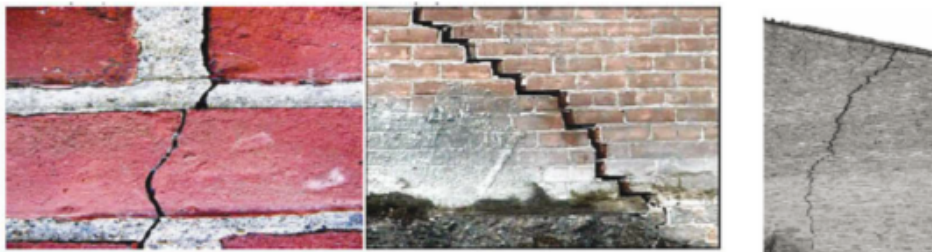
Fracture of detachment in brick walls at different scales [15].
